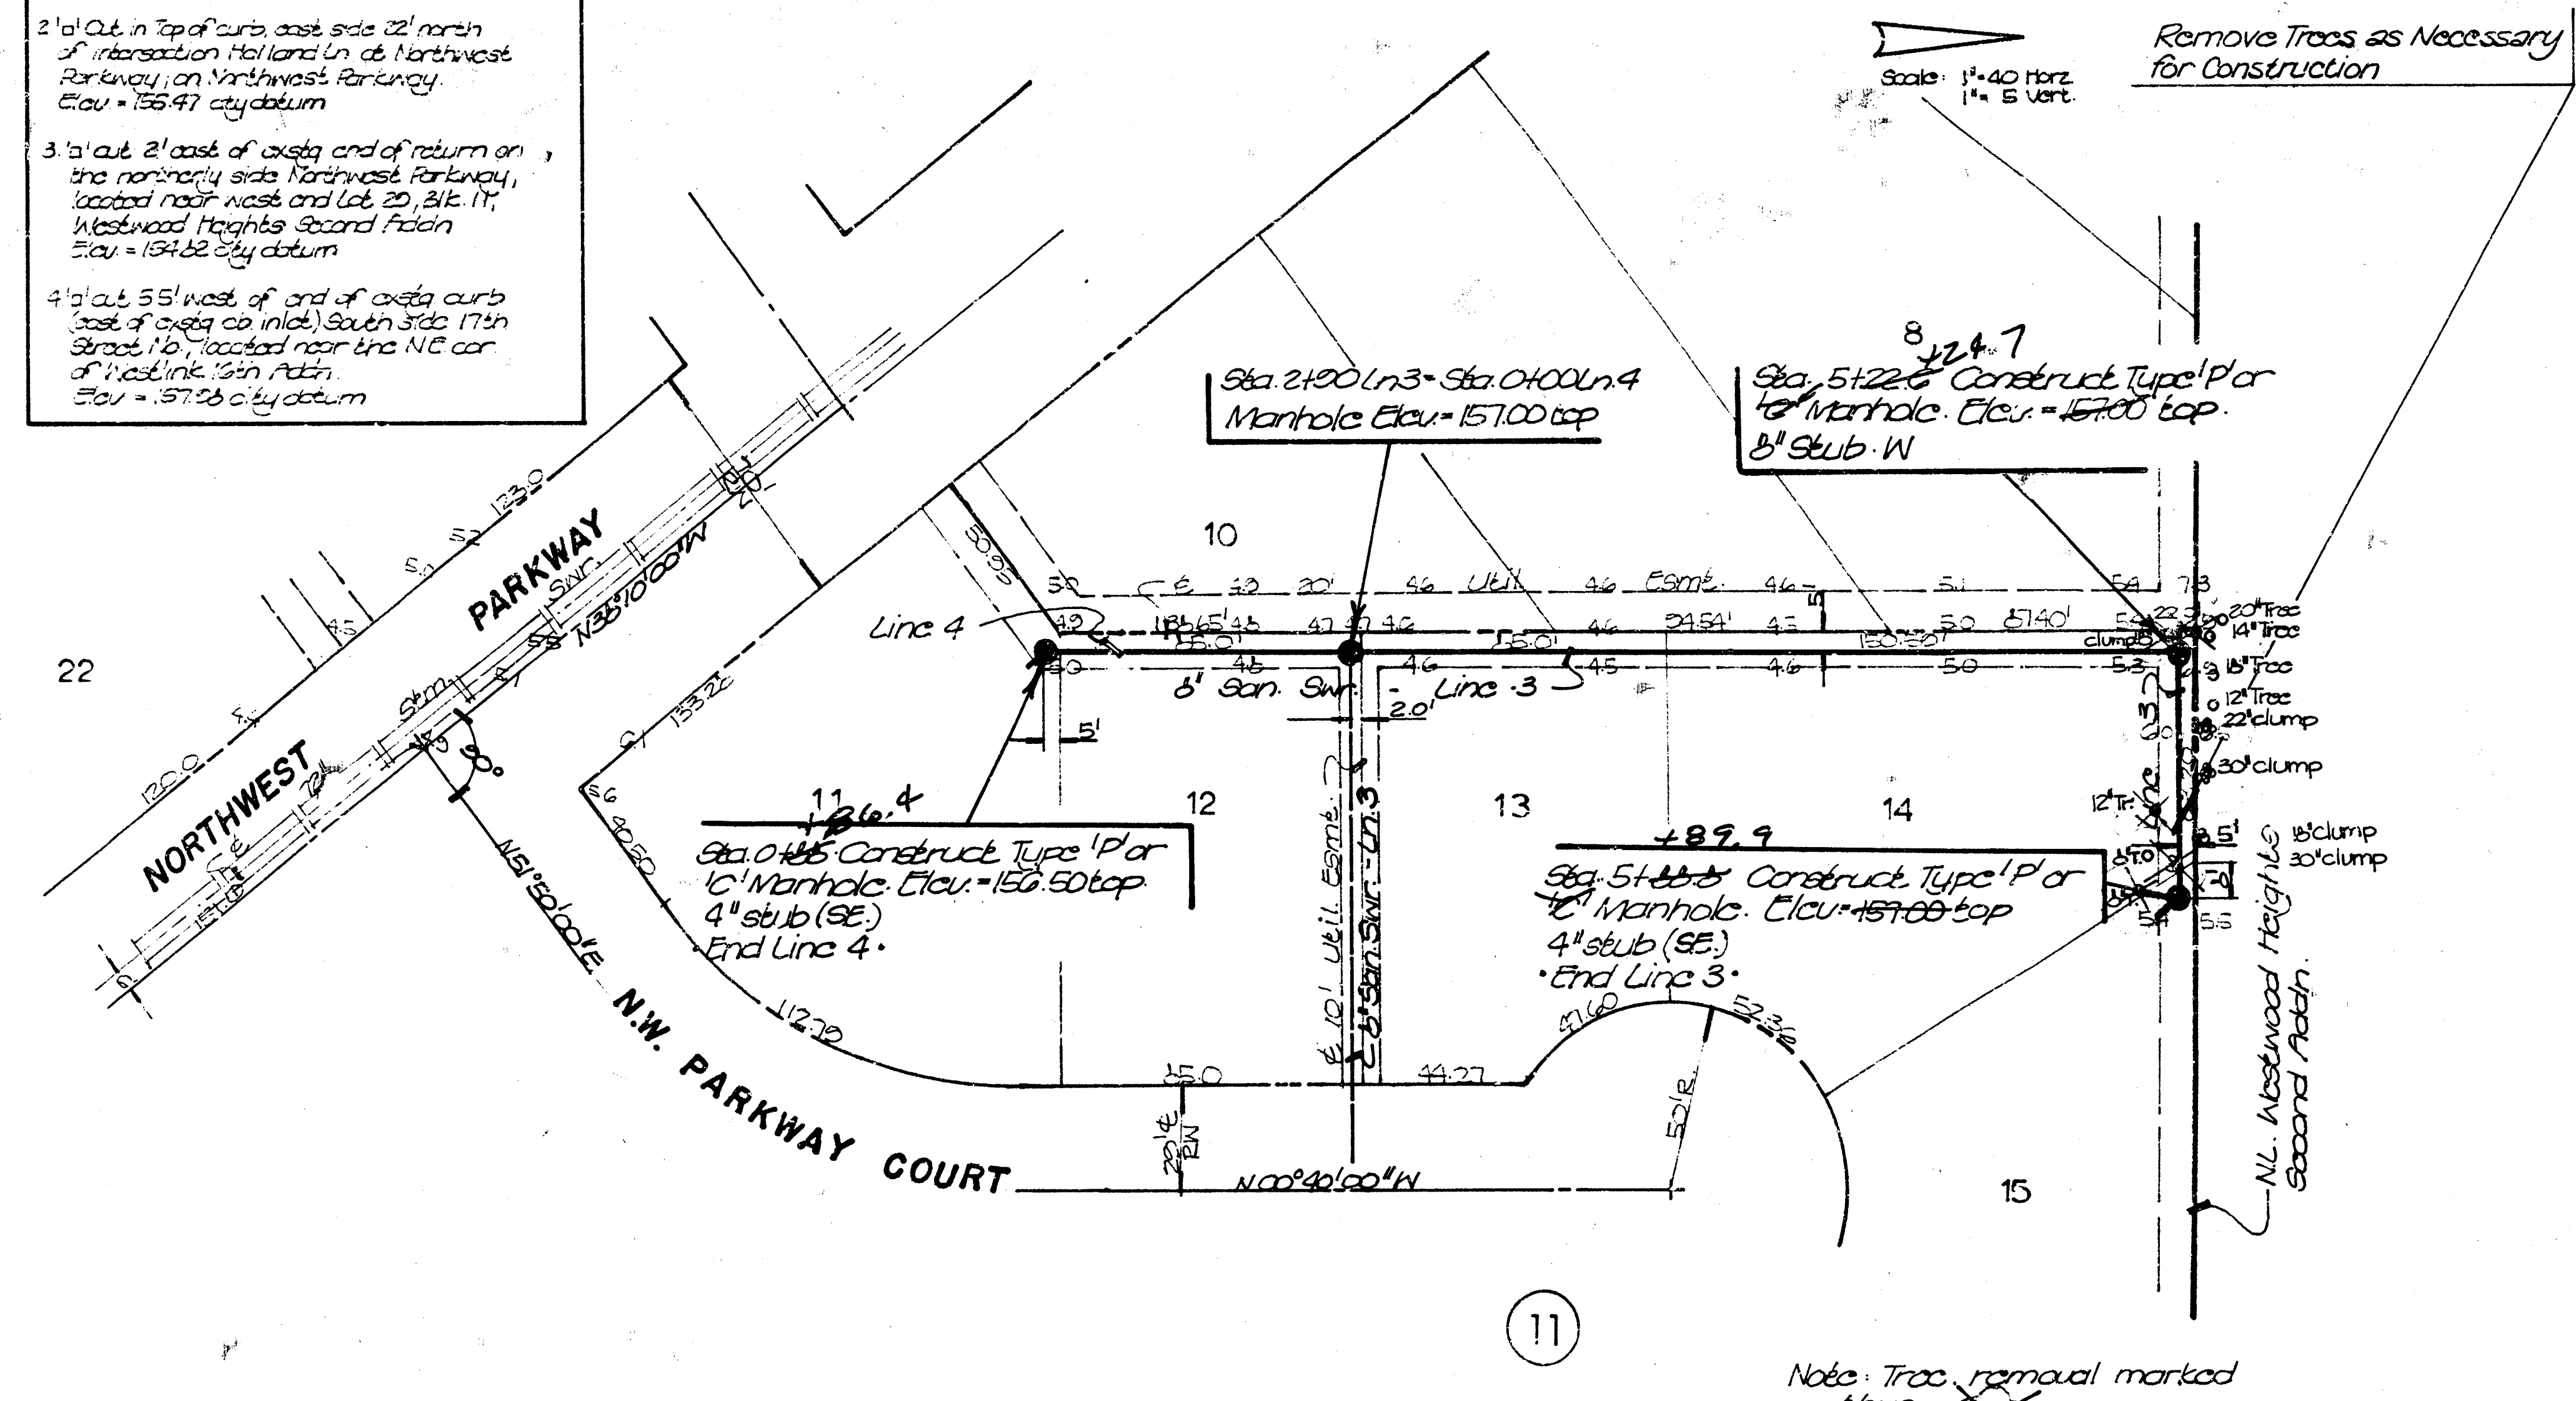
SINGLE PLAN AND PROFILE-ULL LINE
